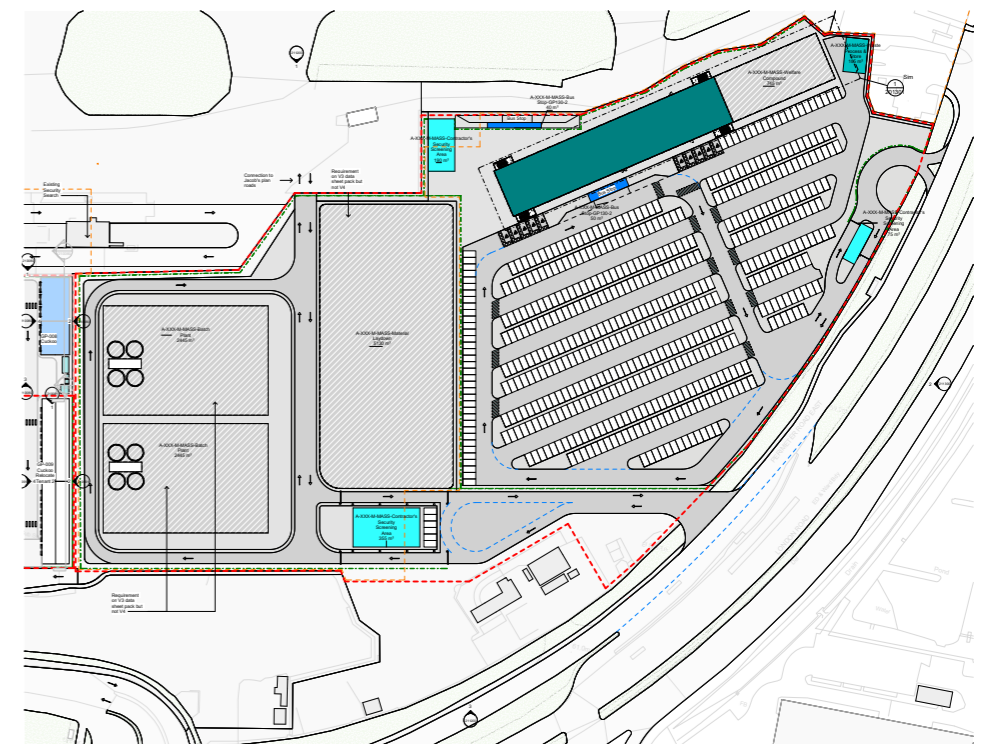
Proposed Ground Floor Plan - MA1 - Main Contractor Compound
